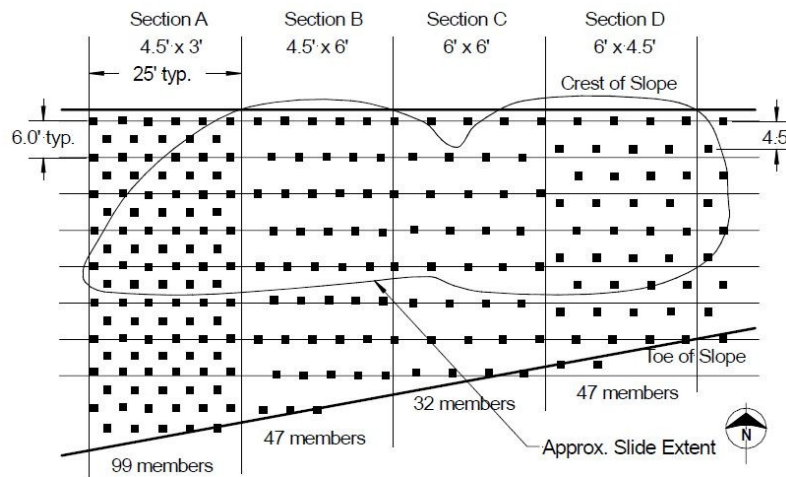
Plan view of stabilized sections of slide area S3 (Loehr and Borders, 2007).
